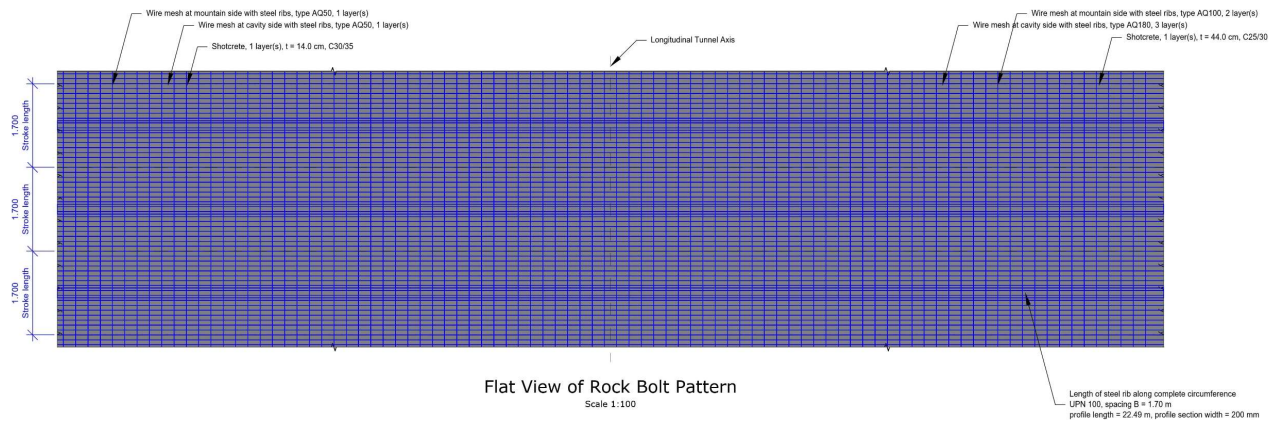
Plan view output on drawing – Wire mesh and steel ribs
